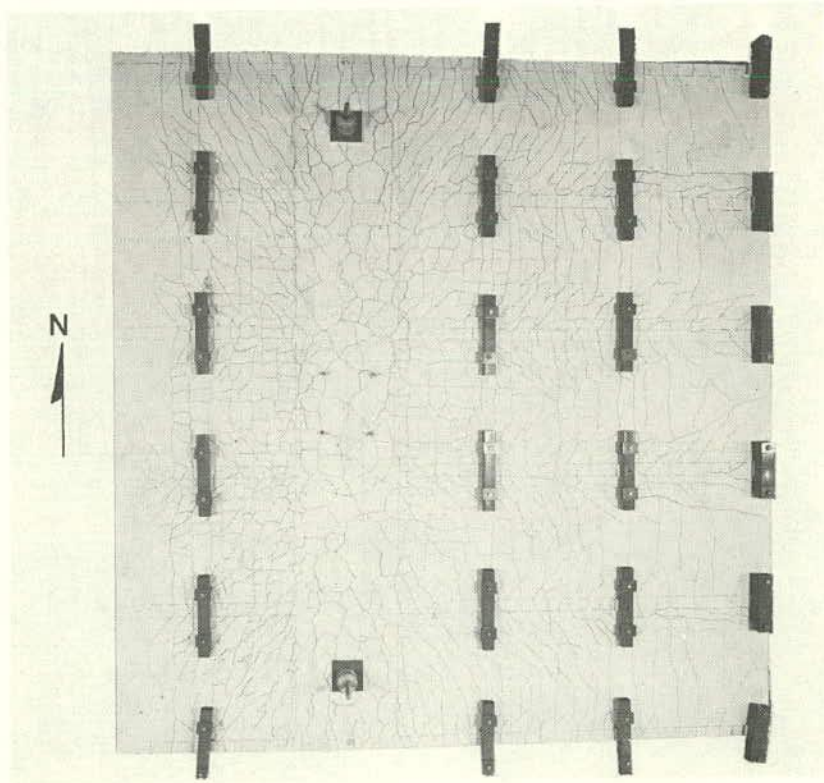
Deck Cracking of Specimen SF-4 at End of Test
